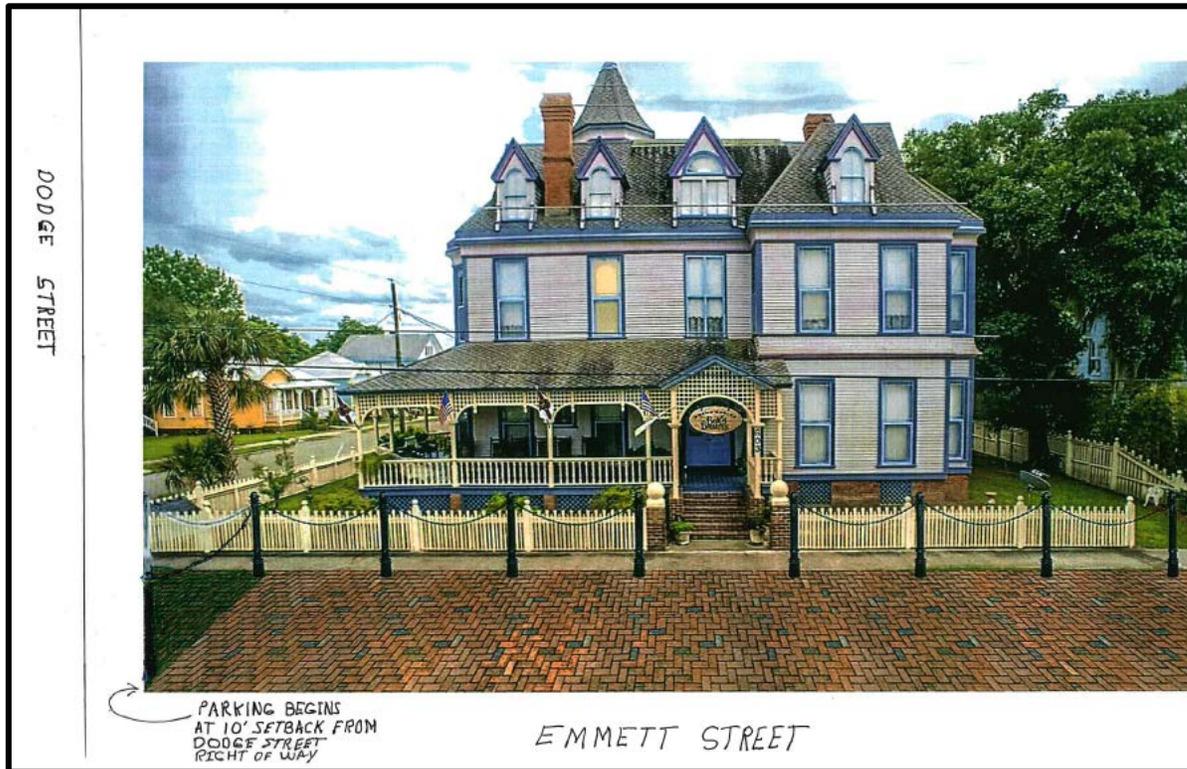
Applicant's schematic of signage, fencing, and right-of-way parking (from Emmett St.)
